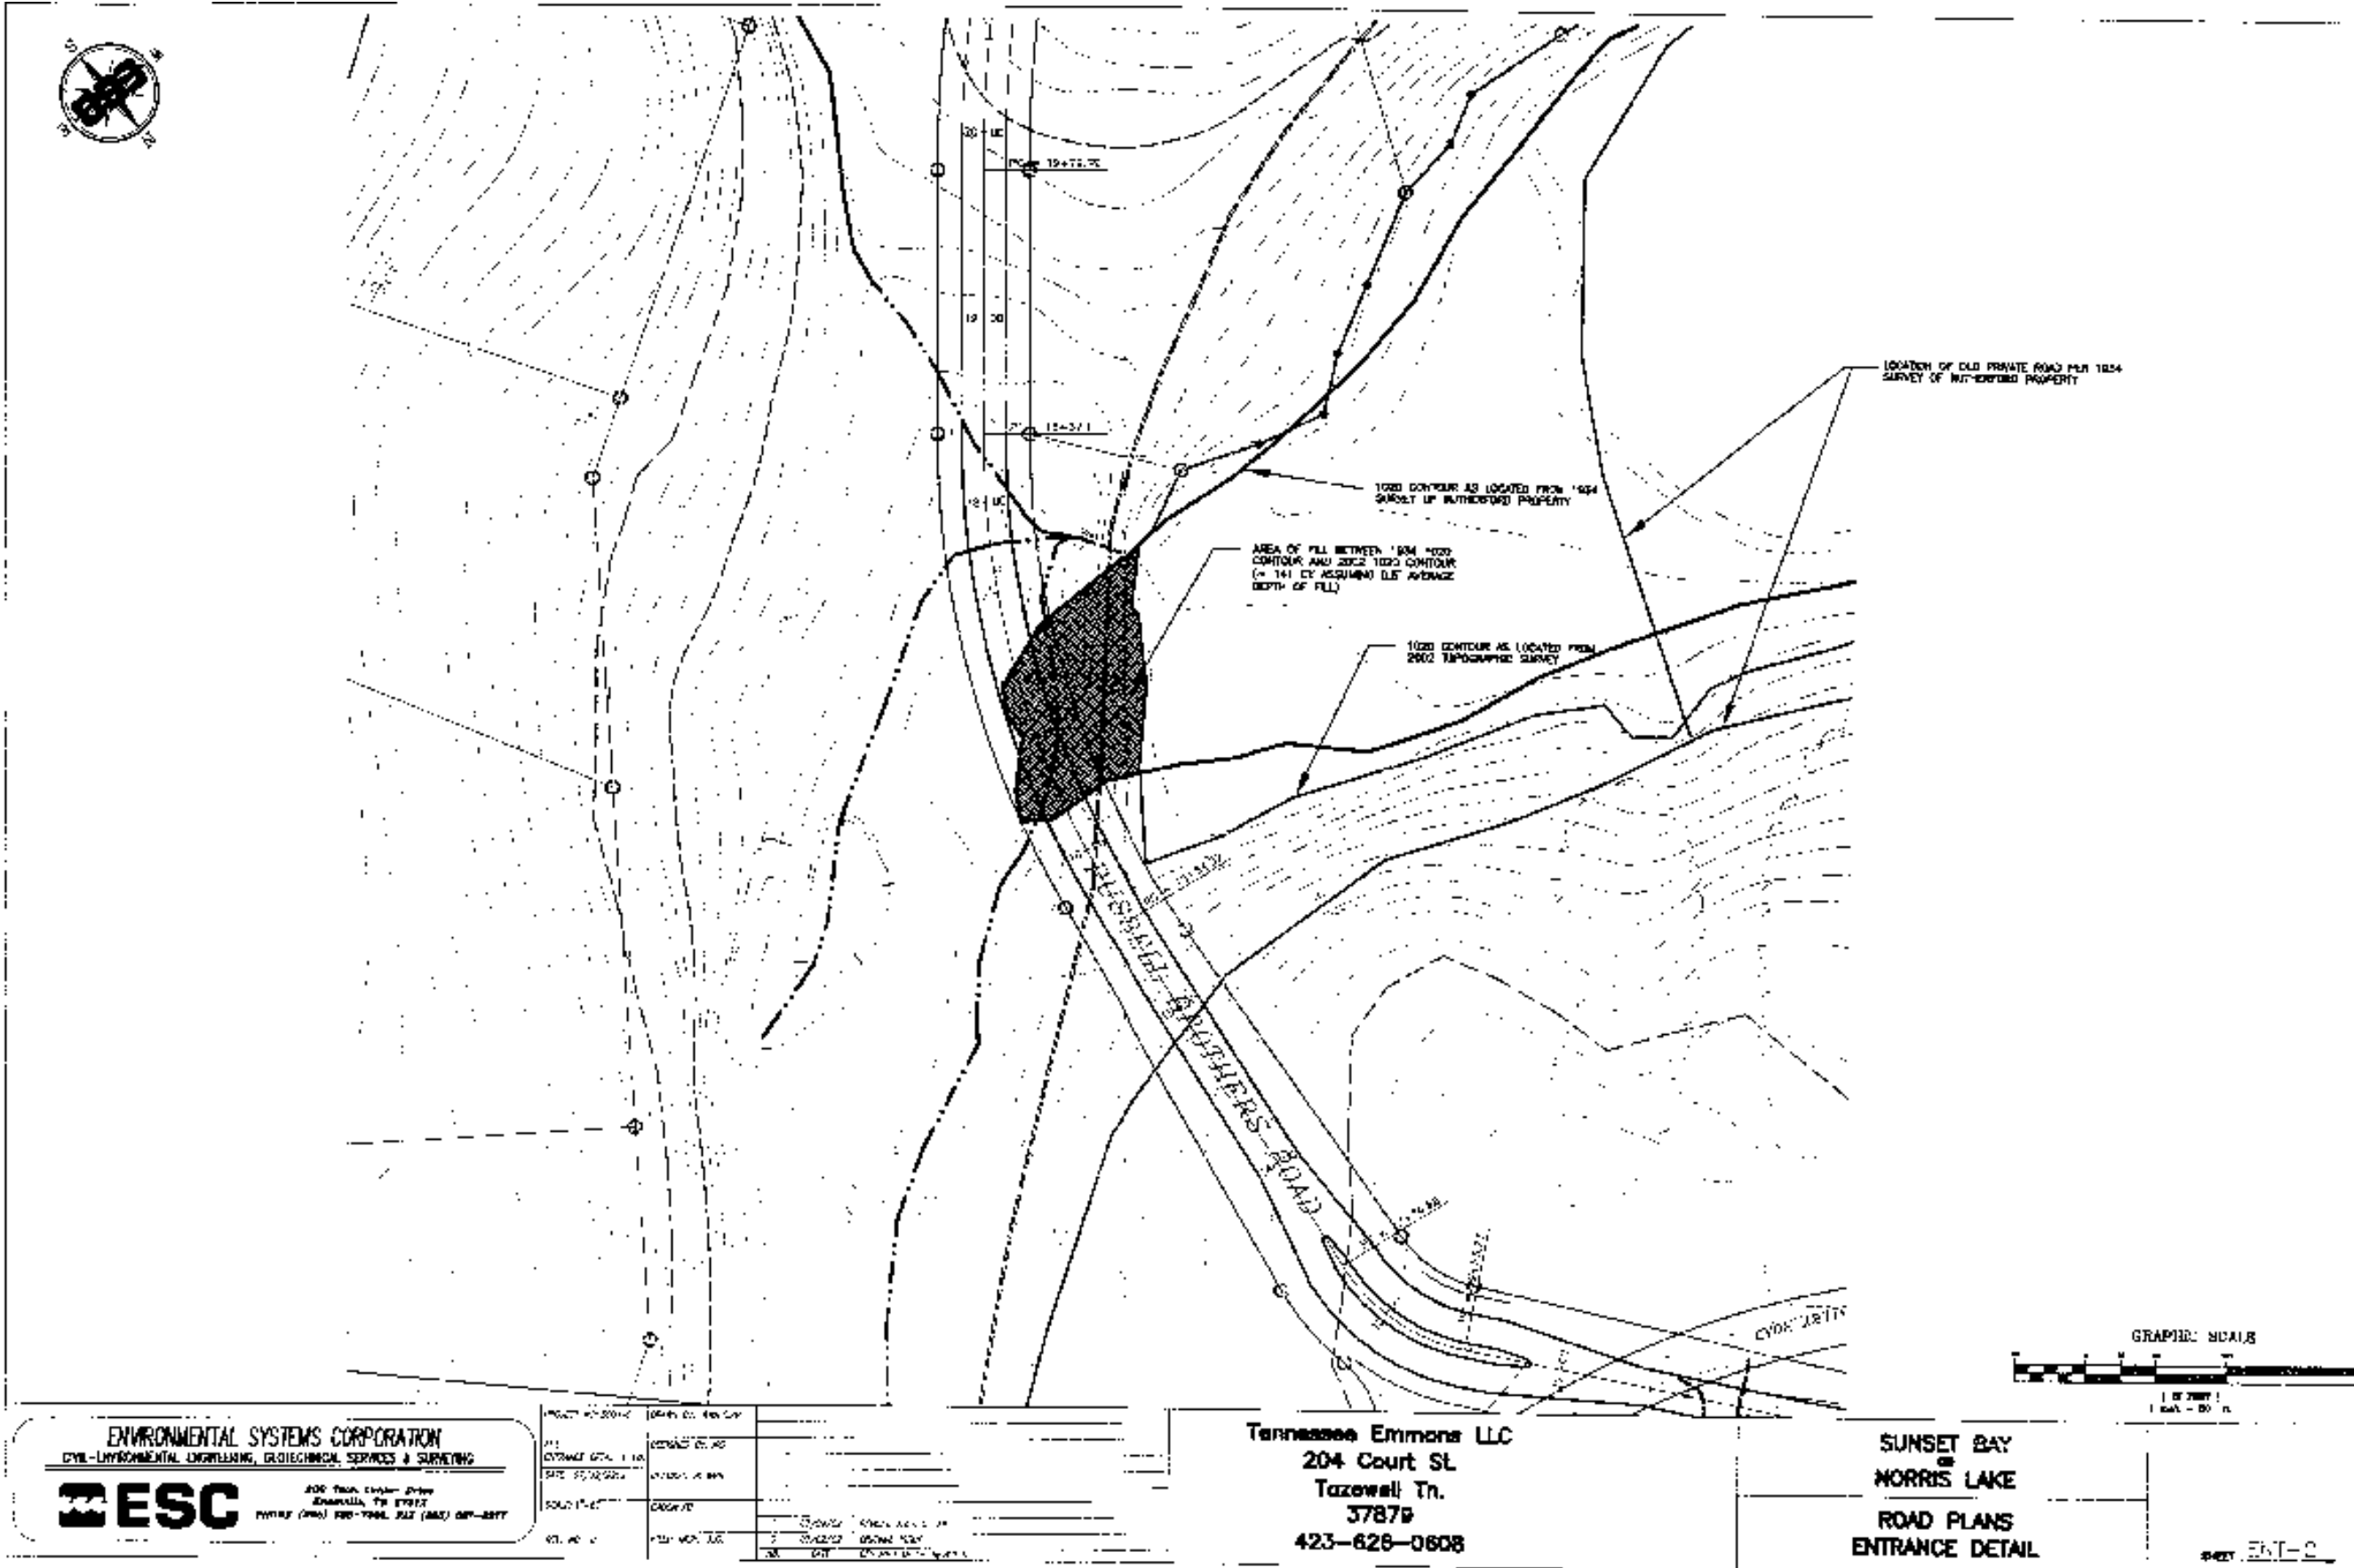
Sunset Bay Road Plans Entrance Detail - Location of Former and Existing Elevation 1020-foot msl and Calculated Old Fill Volume
